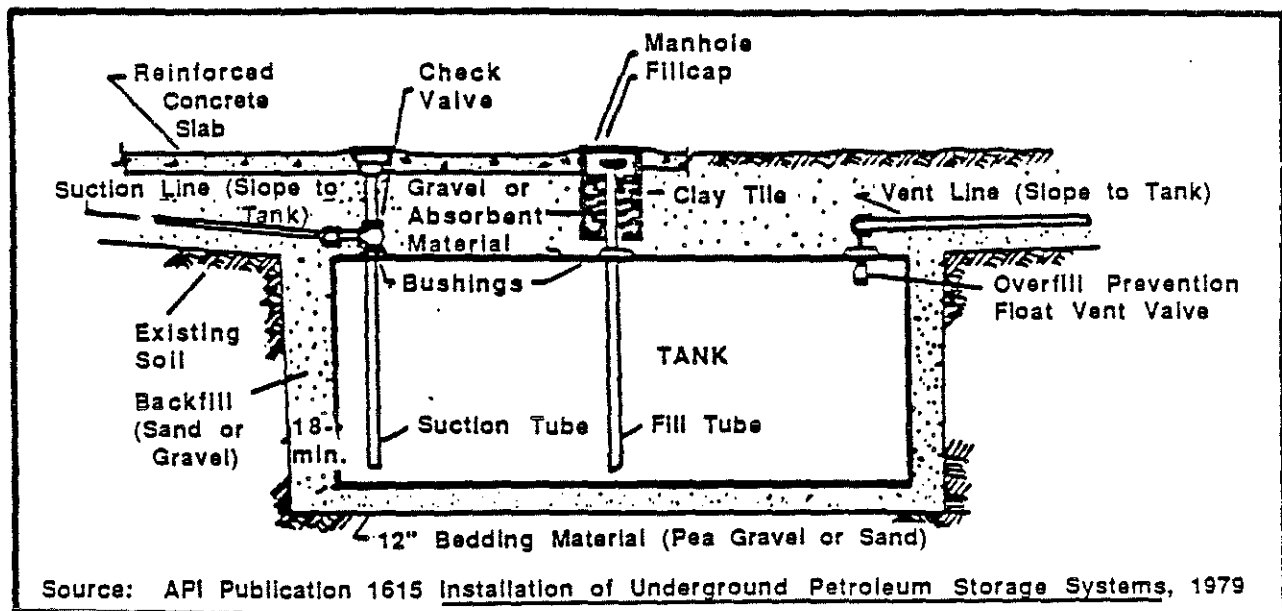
TANK PIPING DETAILS - SUCTION SYSTEM
